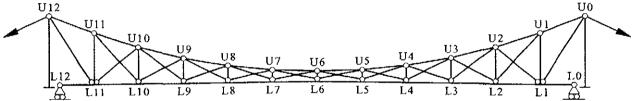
Model A — representing actual geometry of Lower Bridge at English Center (east truss). Panel-point numbering runs from right to left (north to south) to remain consistent with HAER drawings.
